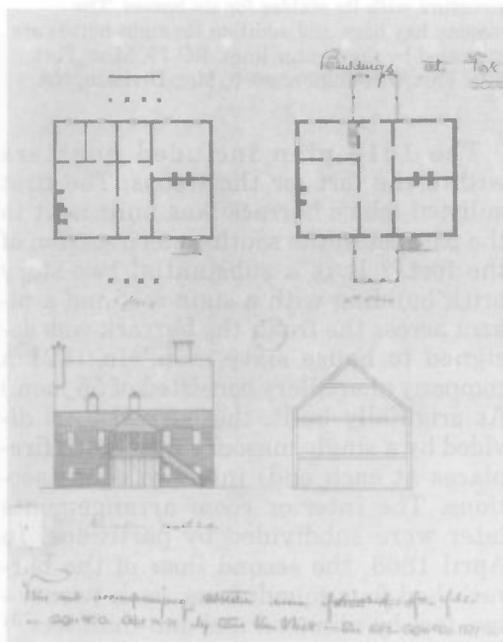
Commanding Officer's Quarters, April 1871. This shows the floor plan and one elevation of the building. The house, still standing, is built on the side of a hill. The south elevation is the side facing the fort. This was one of the few structures built outside the fort prior to the Civil War. RG 77, Misc. Fort File: Fort Washington, no. 8, Map Division, NA.
